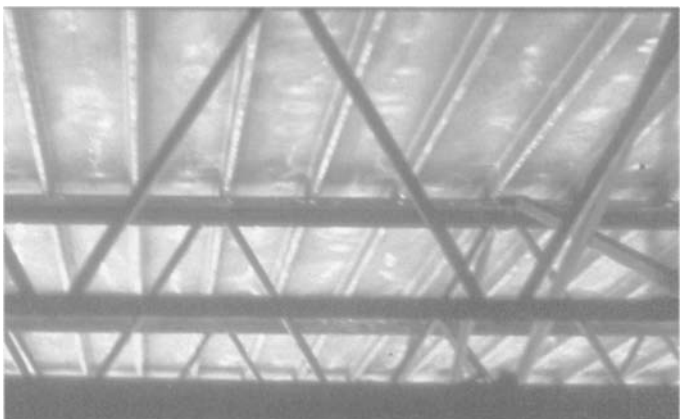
Joists and deck after removing plaster ceiling and overspray.
